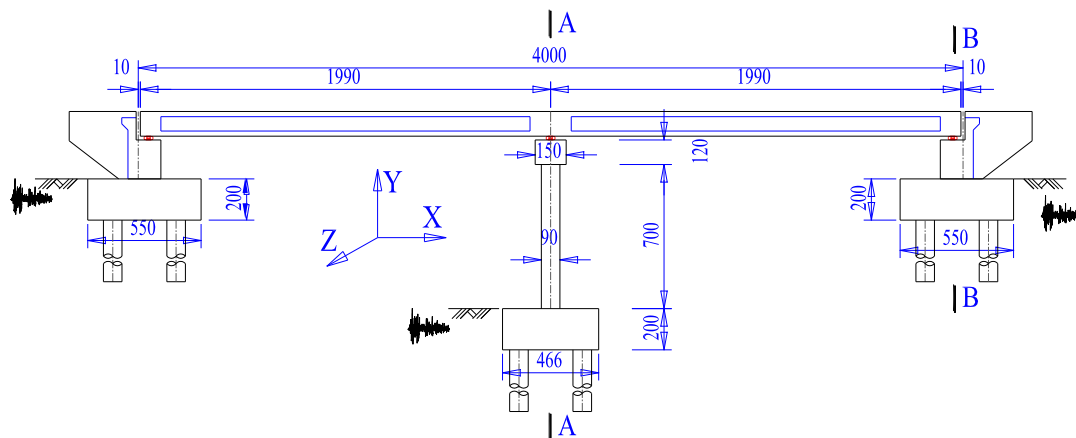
Configuration of a bridge with ECC material reinforced/RC pier (unit: cm)
